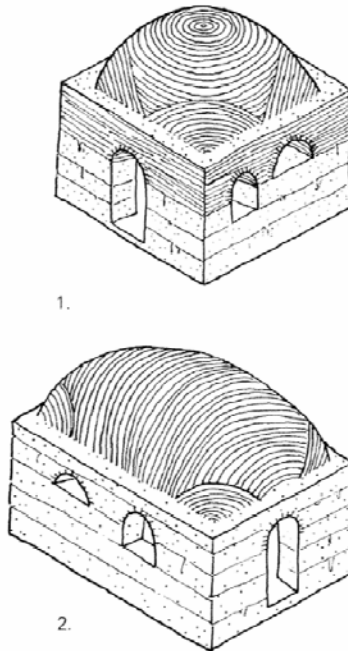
Sketch of Curved-Roof Buildings²⁹²
